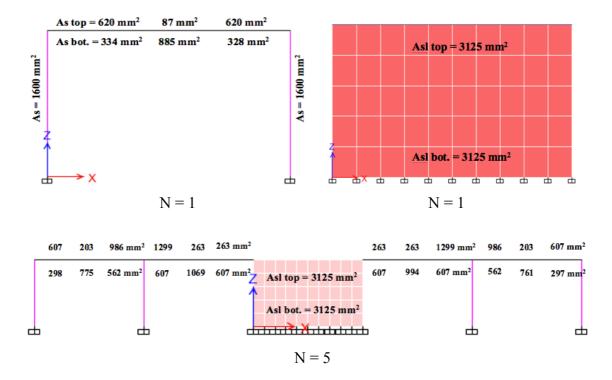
The effect of number of spans on the steel reinforcement of frames and shear walls
